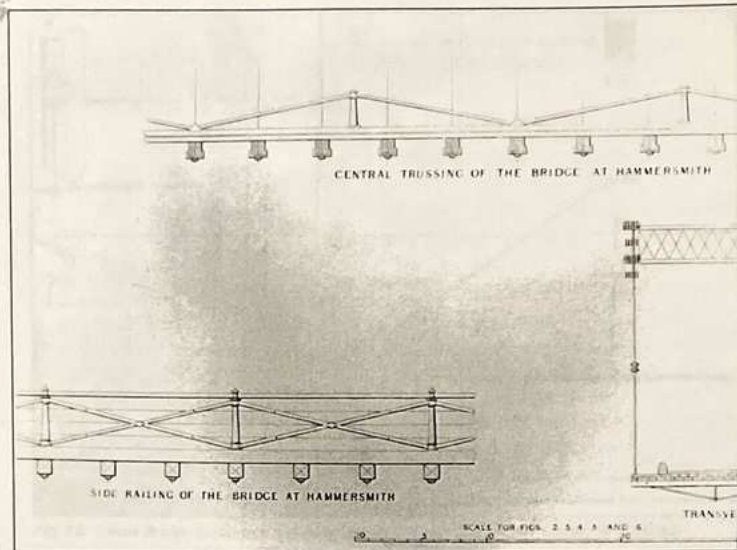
Hammersmith Bridge 1824-27, longitudinal side and central trussing³⁹ (C.W. Pasley)
